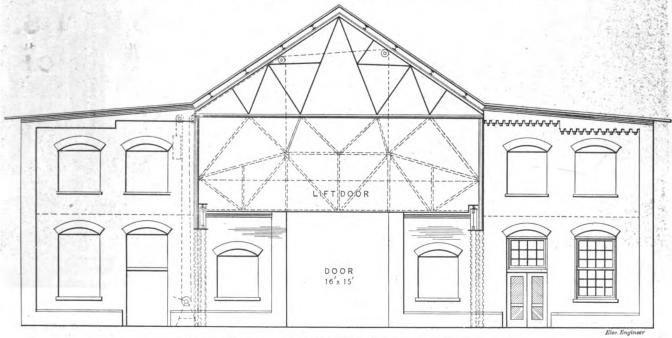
NEW TESTING DEPARTMENT BUILDING, SCHENECTADY.
